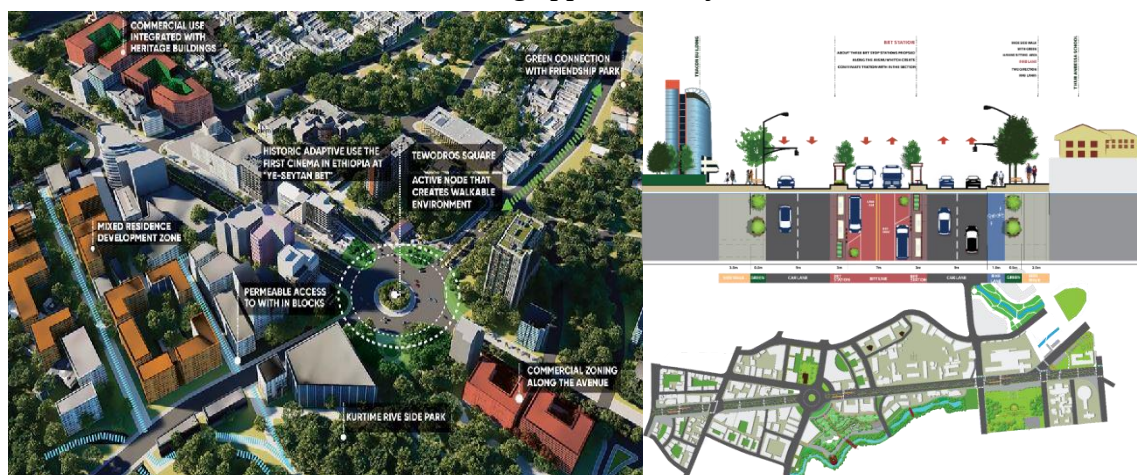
Site plan and 3d illustration of proposed development from Piasa to Behirawi
